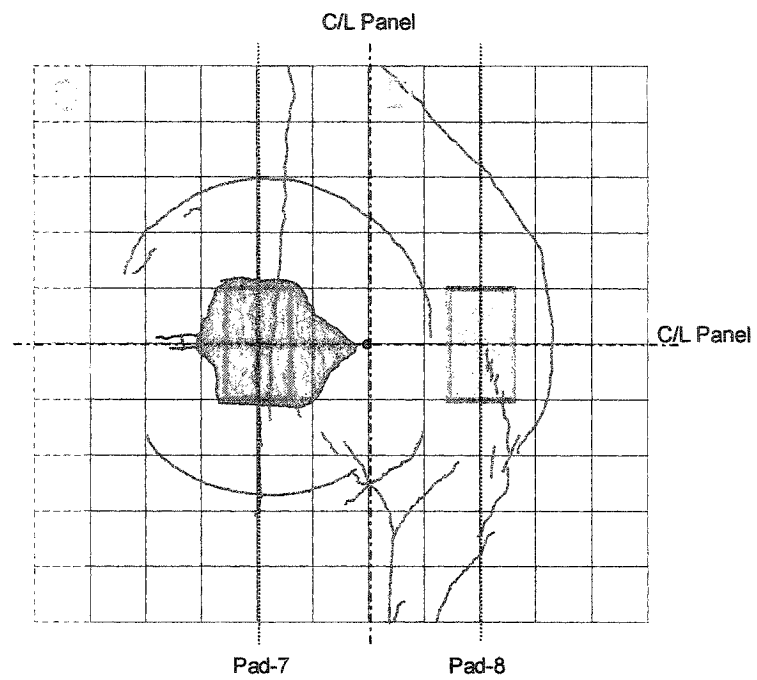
Panel-D: Crack Pattern on Top after Failure
